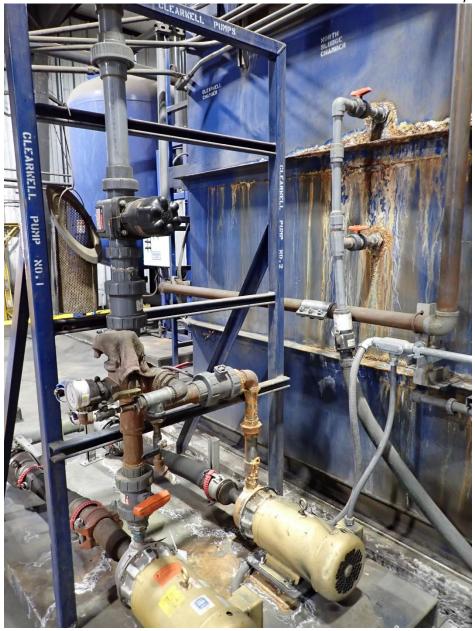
Clearwell chamber. Floor drains lead to the wastewater treatment system.
